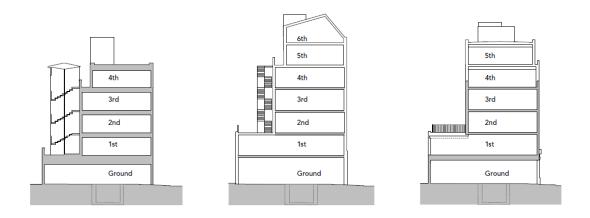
Existing, previously consented scheme under planning ref 2019/2095/P and proposed section
